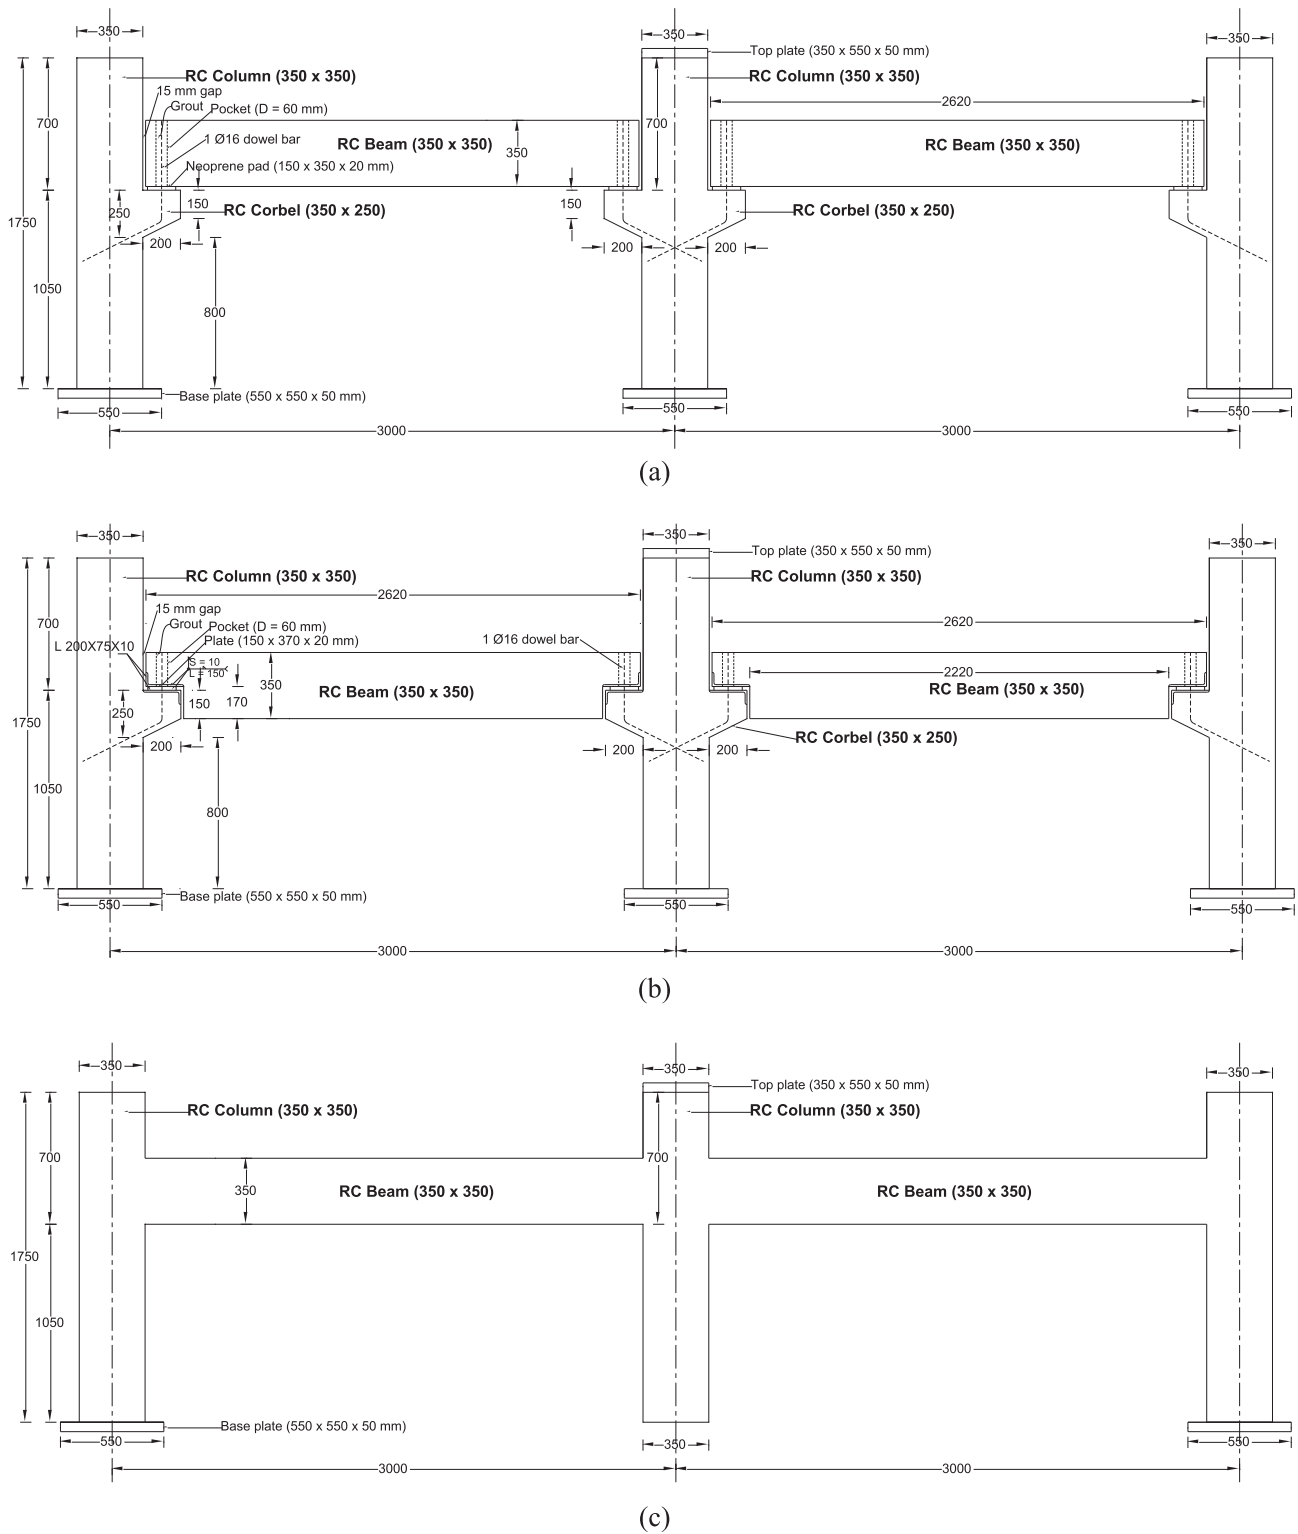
Concrete dimensions of test specimens (Note: All dimensions are in mm): (a) Specimen PC-A; (b) Specimen PC-B; (c) Specimen MC-SMF.
